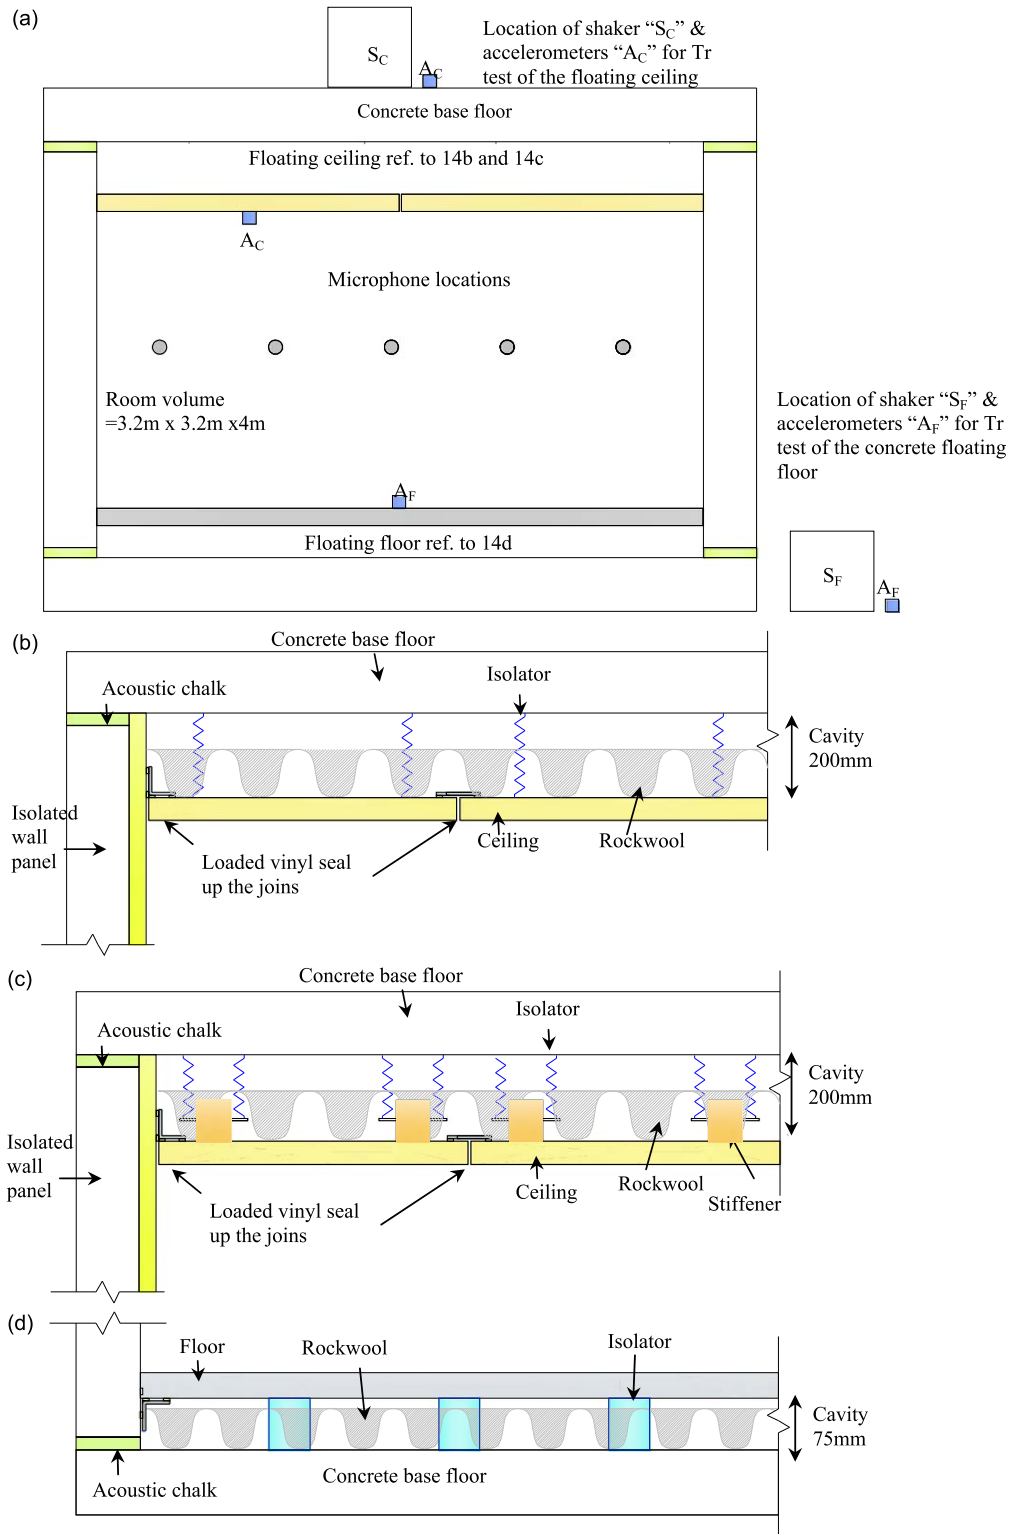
(a) Experimental set-up in the studio. (b) Construction of floating ceiling with no stiffener. (c) Construction of floating ceiling with stiffener. (d) Construction of floating floor (not to scale).
